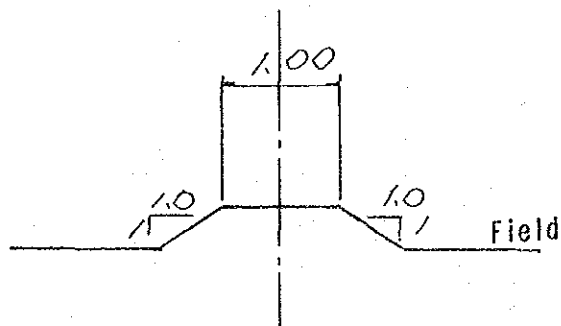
FARM ROAD STANDARD CROSS SECTION
